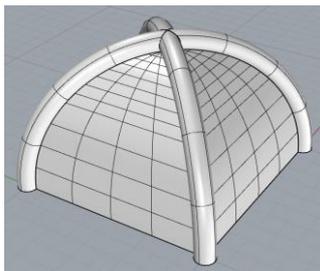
2 intersecting air pipes and 4 mechanically stressed walls
